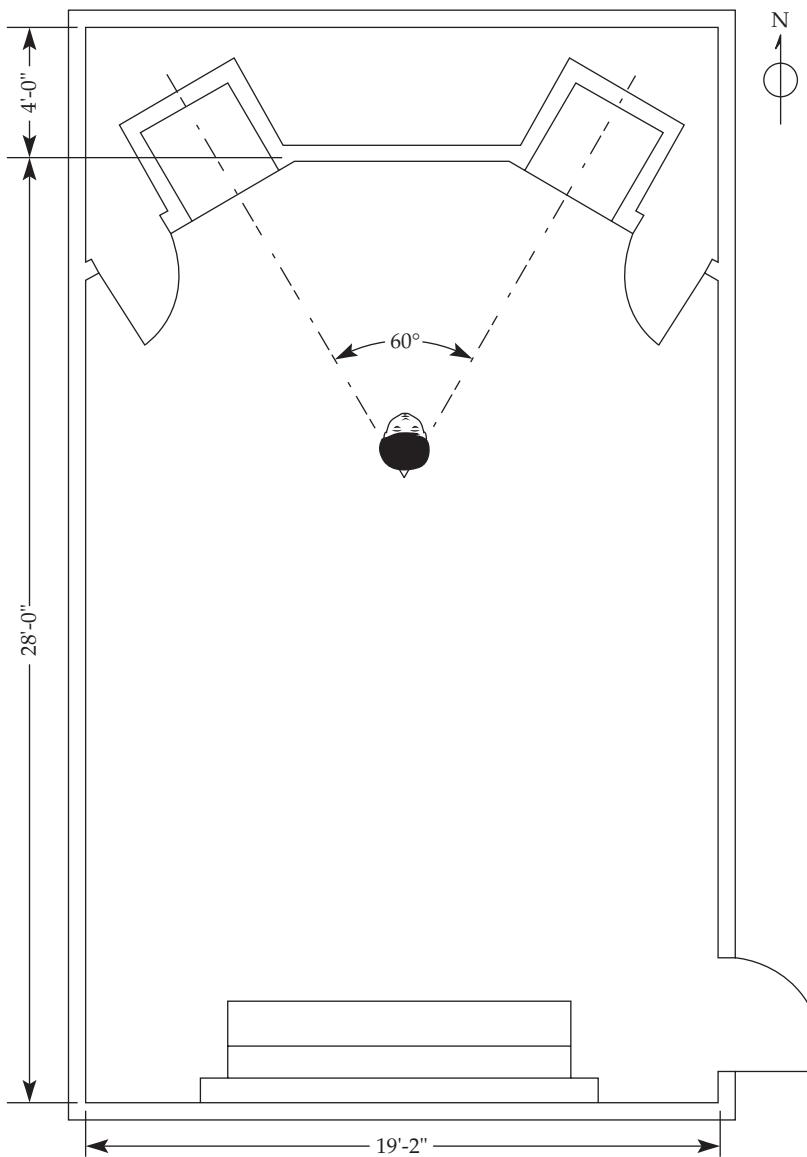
Plan view of a large postproduction room (Design Example 2) showing placement of built-in monitors and workstation on the rear wall.
